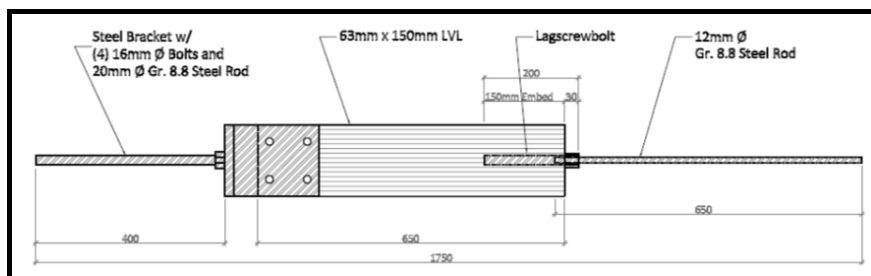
Timberlinx Furnace Test Specimen Schematic Drawing
